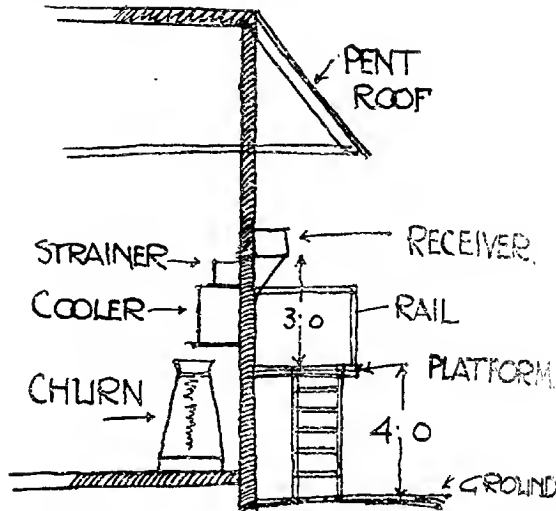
Beansheaf Farm: Section through Cooling Room.
